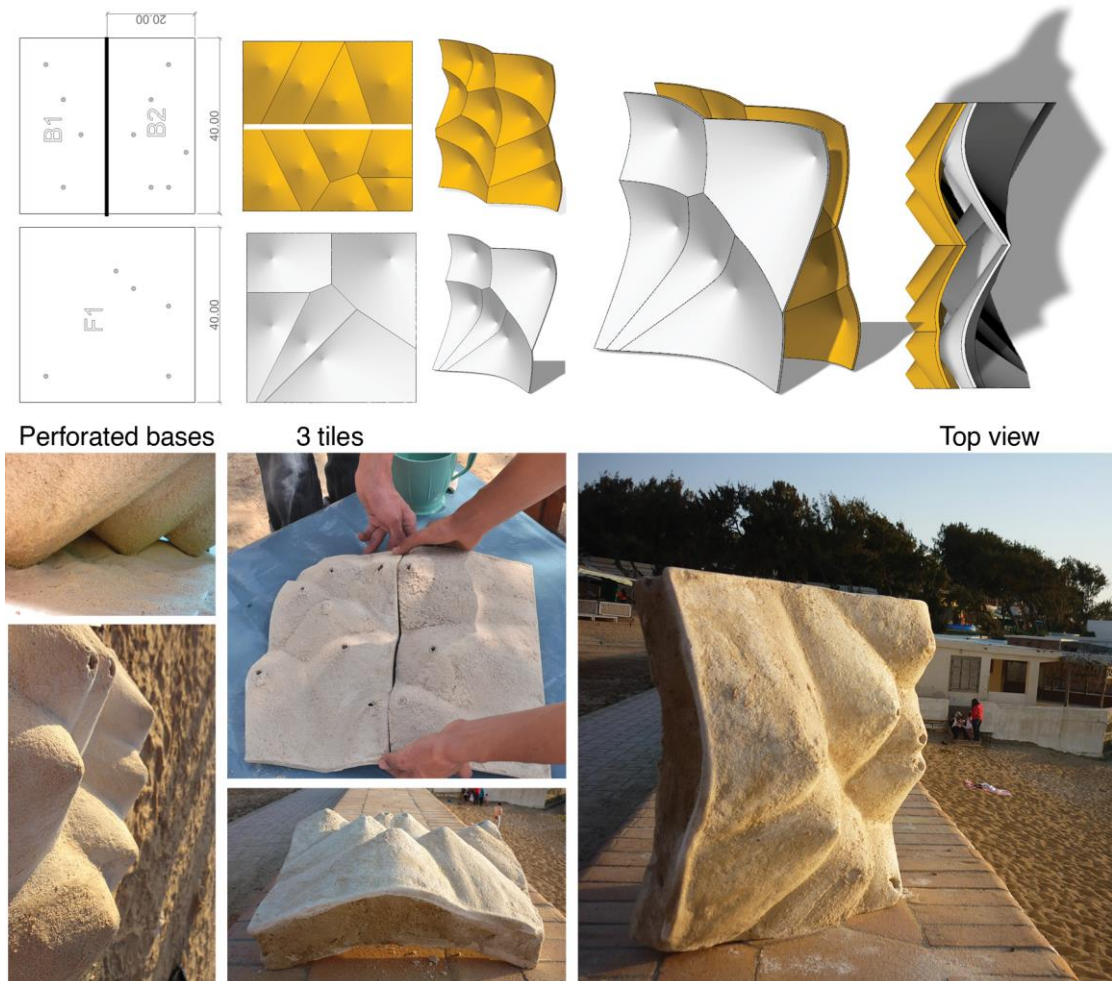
Drawings and making of the model Alex-12. The block is fabricated from three panels
